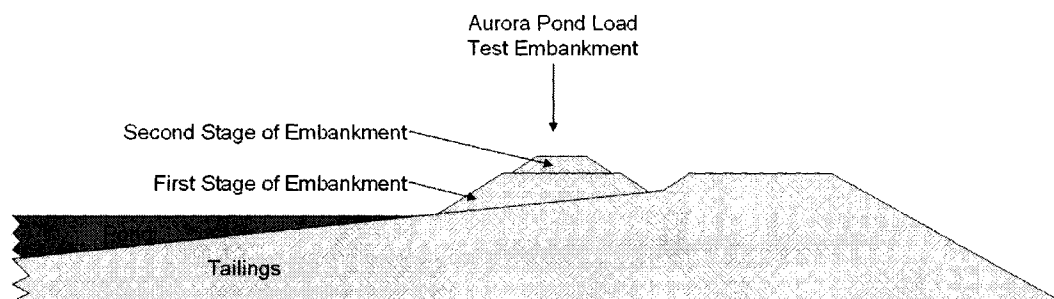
Aurora pond load test conceptual cross section (not to scale)
